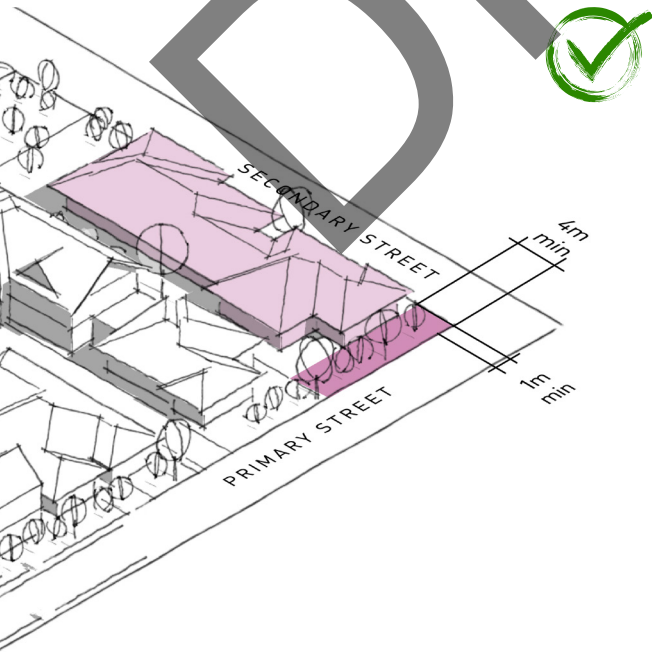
Single House and Grouped Dwellings - Street Setback Example Diagram
